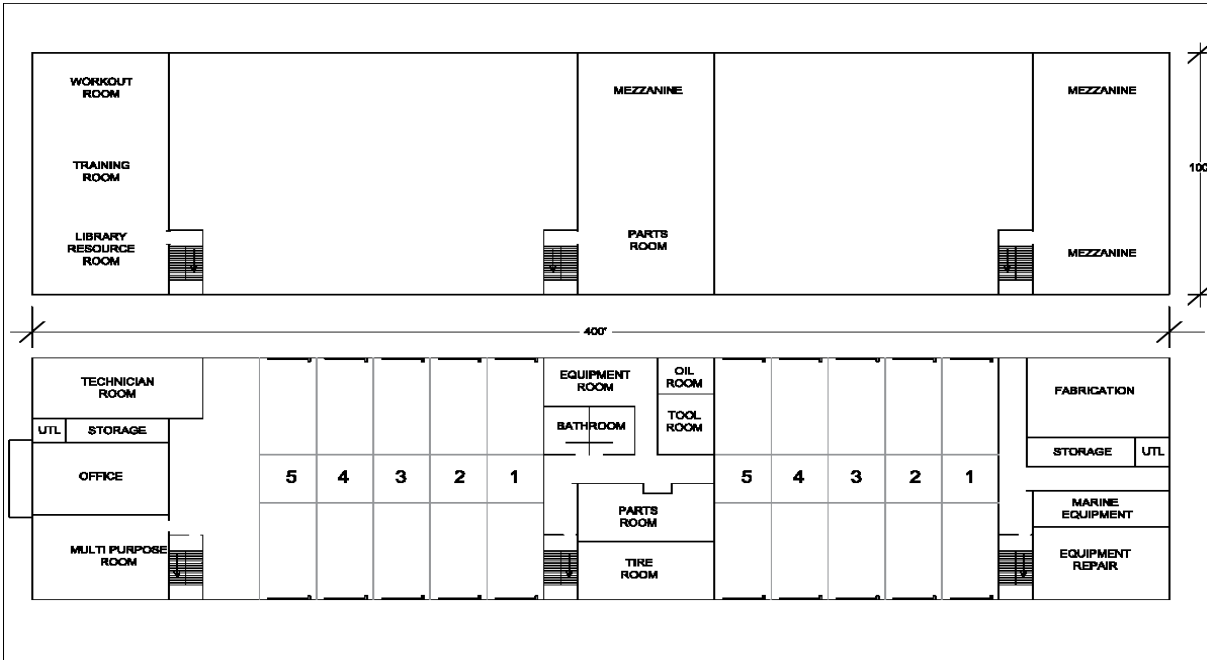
EXHIBIT A | CONCEPTUAL FLOOR PLAN (NOT FINAL LAYOUT)
